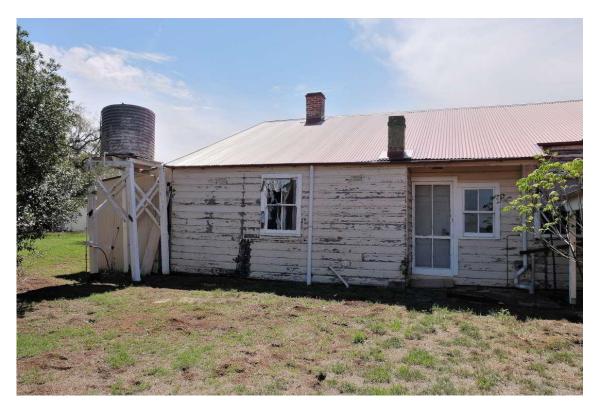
View of the north elevation of the rear wing of Plashett Homestead.
